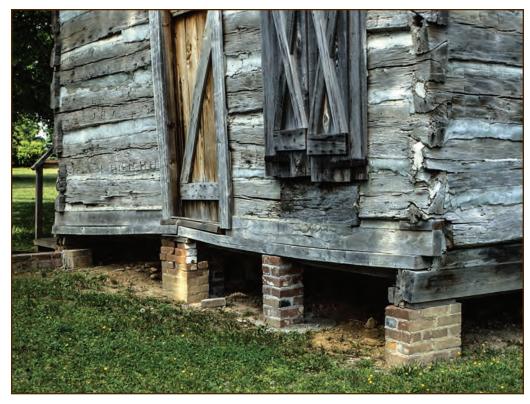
This building shows evidence of several inappropriate "repairs." The piers supporting the building are of different types of brick and were constructed using at least three different construction methods. Someone used modern dimensioned lumber to replace the sill and spandrel logs. The door may originally have been located where a log "patch" is placed under what is now a shuttered window. People used at least two different styles and materials for the daubing. Someone also used daubing material to "patch" deteriorated areas on the ends of some of the logs.
